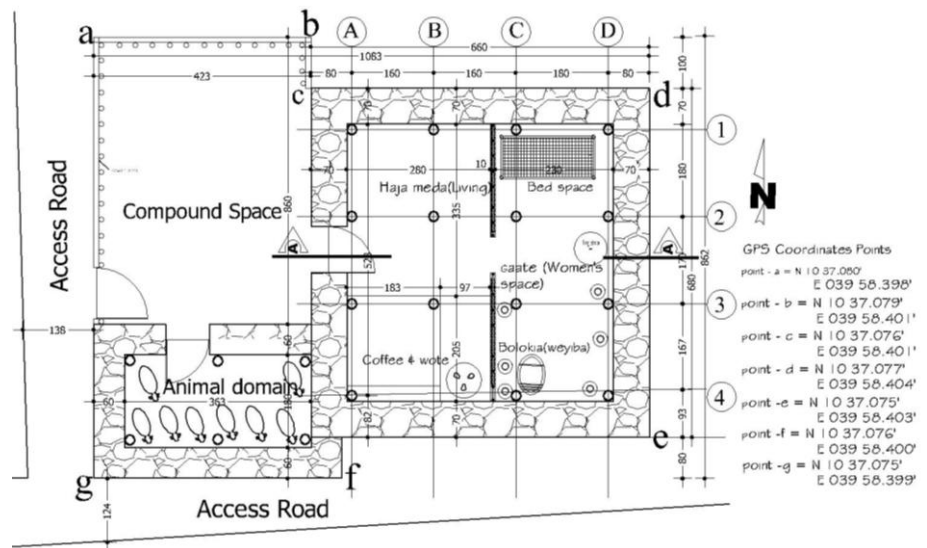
147 compound and floor plan of Ato Mohamed Sheku
